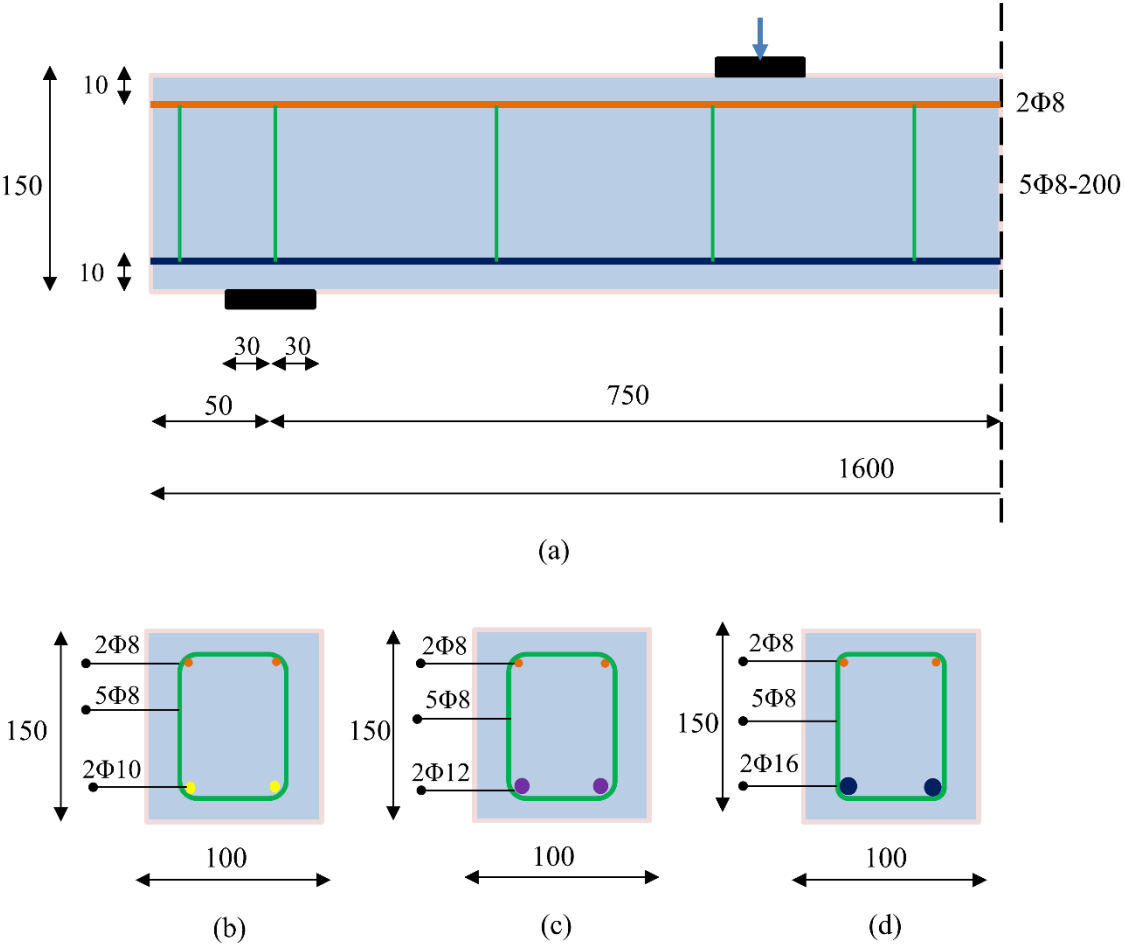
Dimensions and reinforcement information of FLC beams (units: mm): (a) Half elevation of the test beam. (b) Cross section of low-reinforcement-ratio beams. (c) Cross-section of medium-reinforcement-ratio beams. (d) Cross-section of high reinforcement ratio beams.
